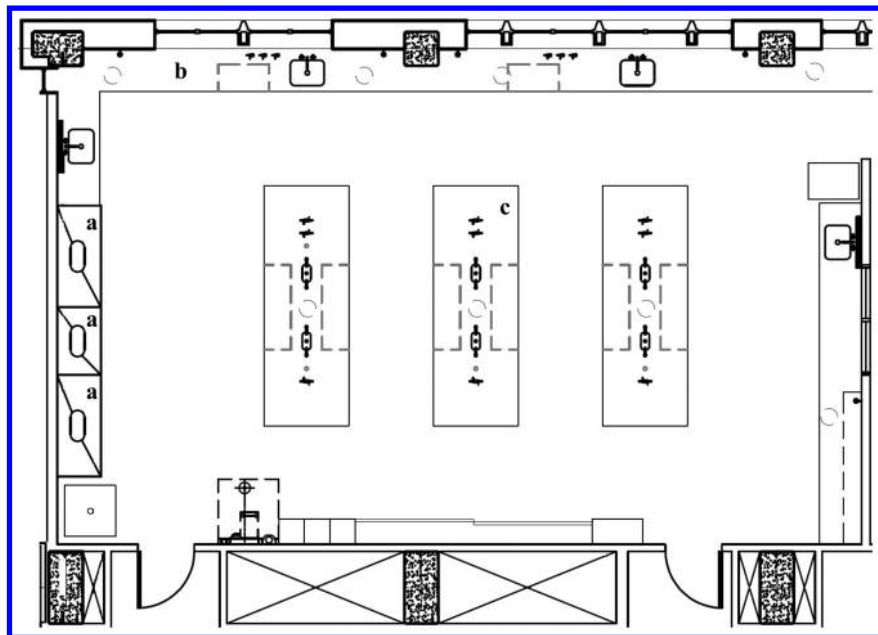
Laboratory layout for chemical synthesis. (a) Two six foot and one four foot hoods occupy one interior wall, (b) exterior wall comprised of large windows, and (c) fixed lab benches provide work surfaces and storage.
